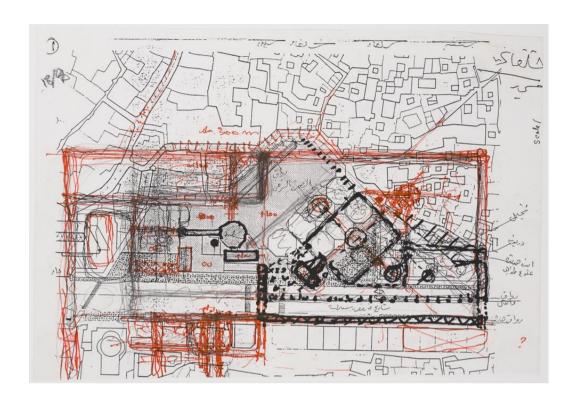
Architect's sketch over a photocopy of the site location plan; area adjacent to Khulafa Street. Source: (Aga Khan Documentation Center at MIT, Mohamed Makiya Archive).
